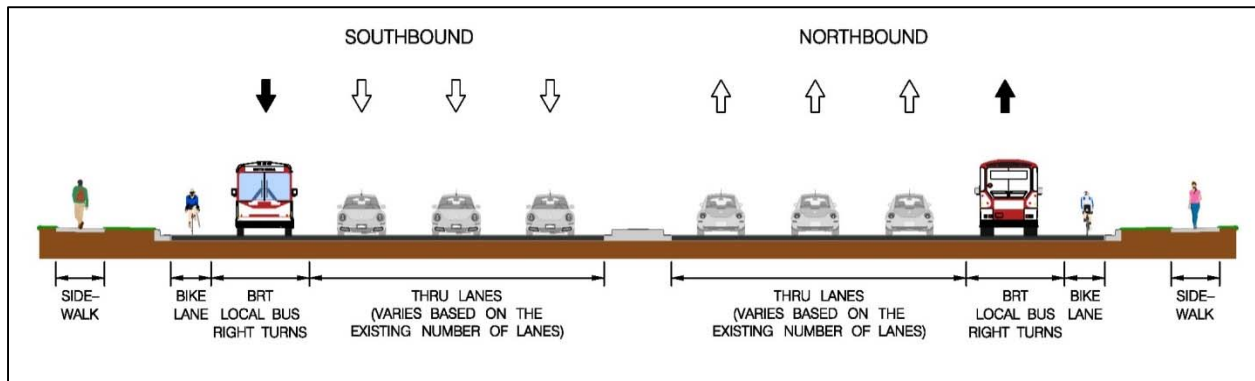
Alternative 4B - Section 3: Rockville Town Center
